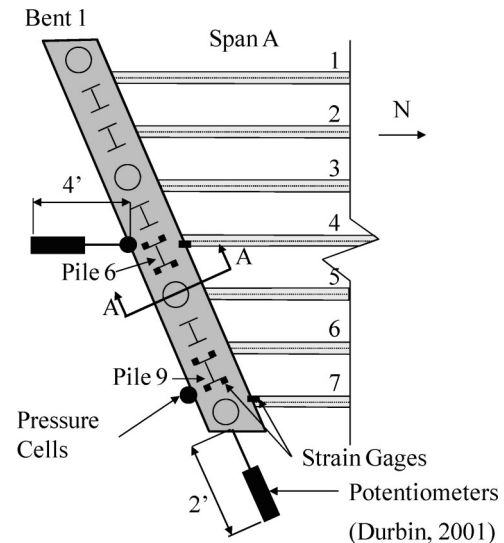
Plan View of I-65 over SR-25 Instrumentation Plan
